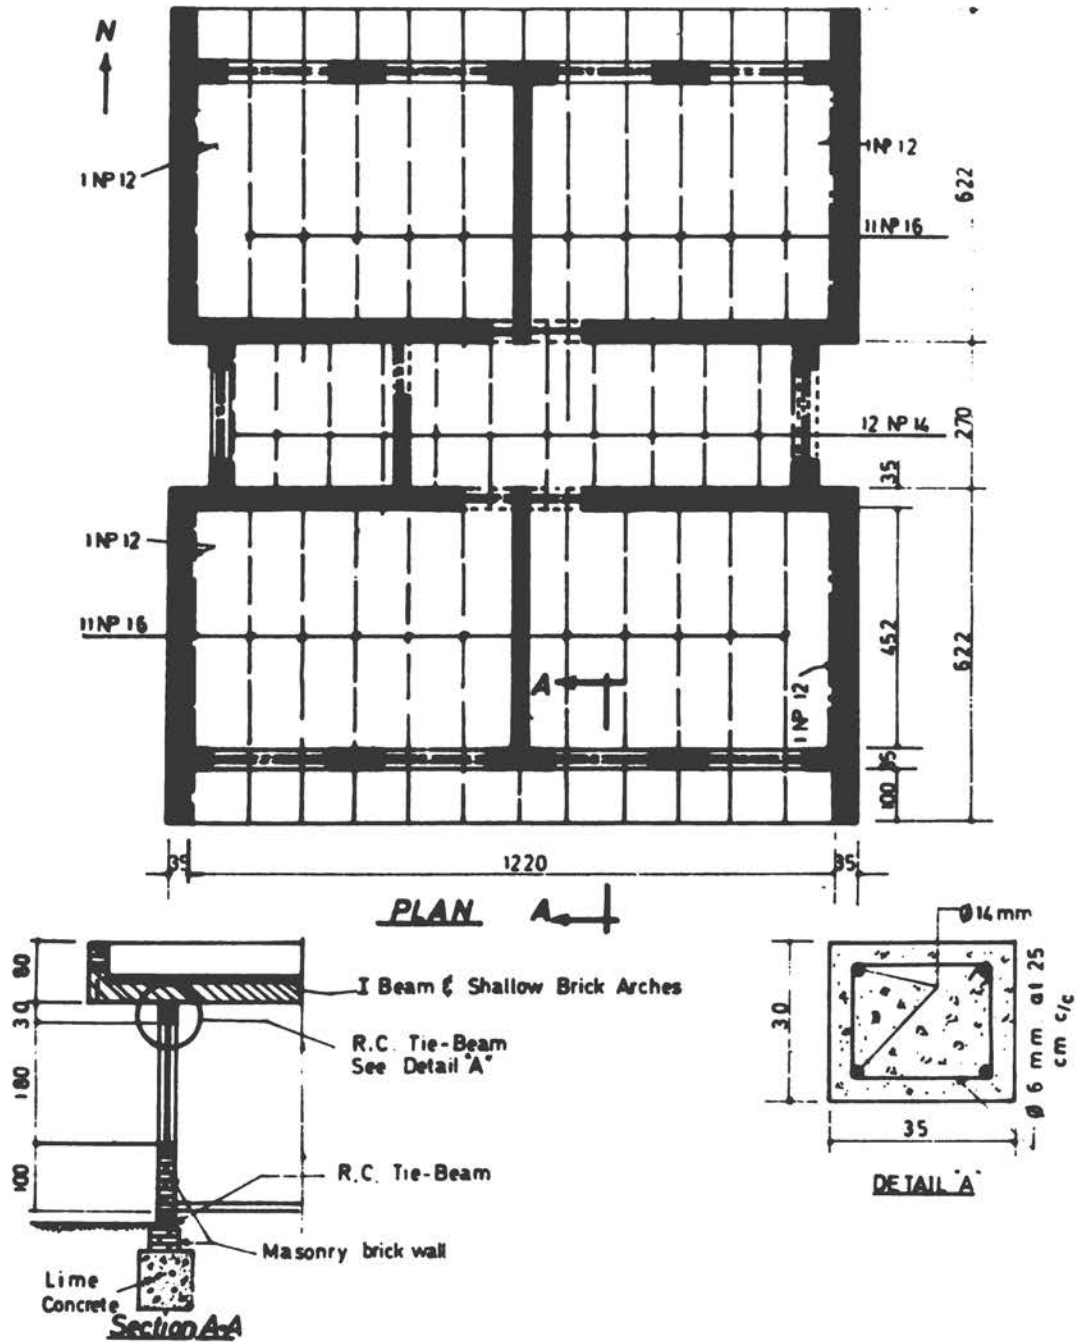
Summary Plan and Details of the Elementary School in the Village of Marand.
